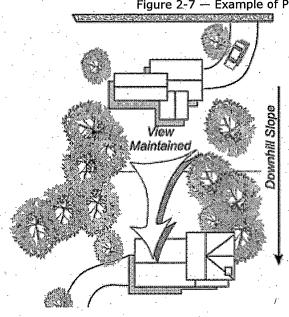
Siting New <u>Building</u> to Preserve Views
